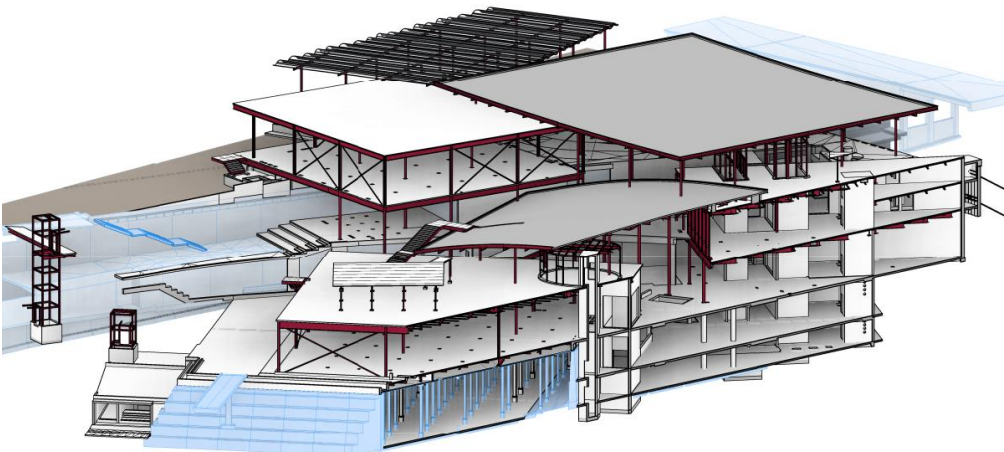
Section from structural Revit model; fuel bunker at bottom left-centre & land bridge at rear.
